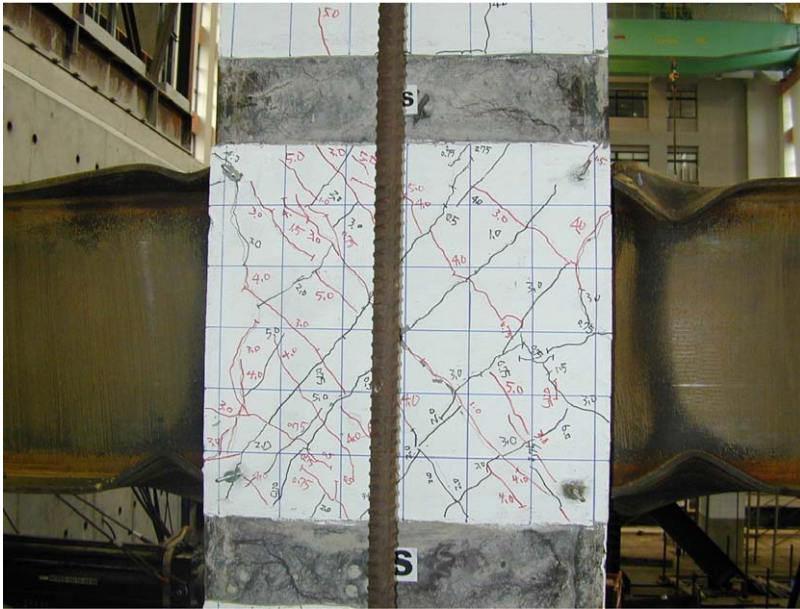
A photograph showing the damage of the beam flange for specimen INUC after the test.
